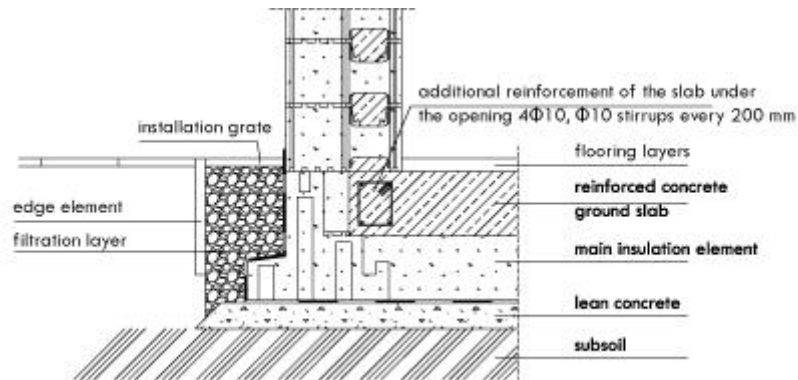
Reinforcement of a circumferential tie beam of the slab
